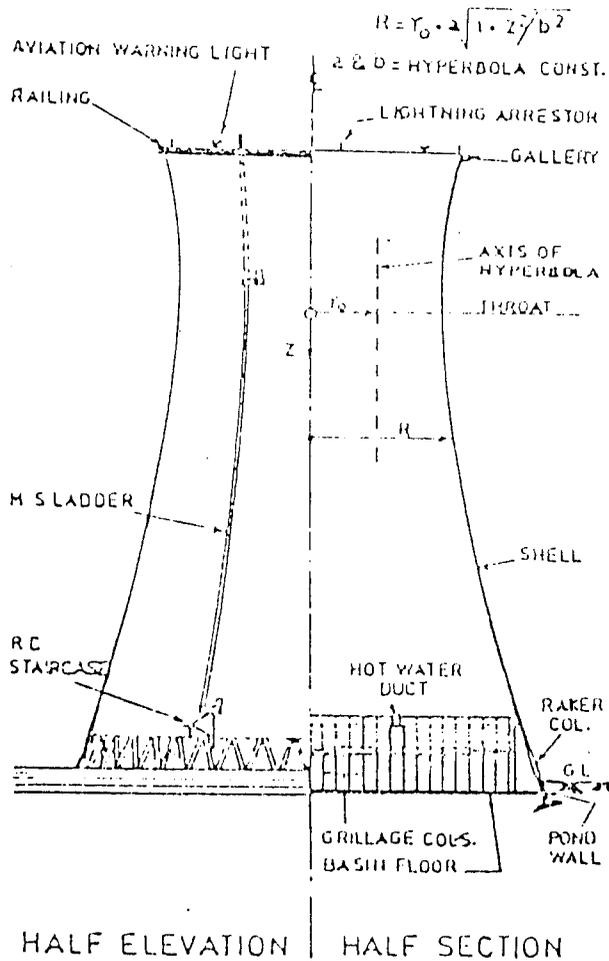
Typical Cross Section of Natural Draught Cooling Tower
